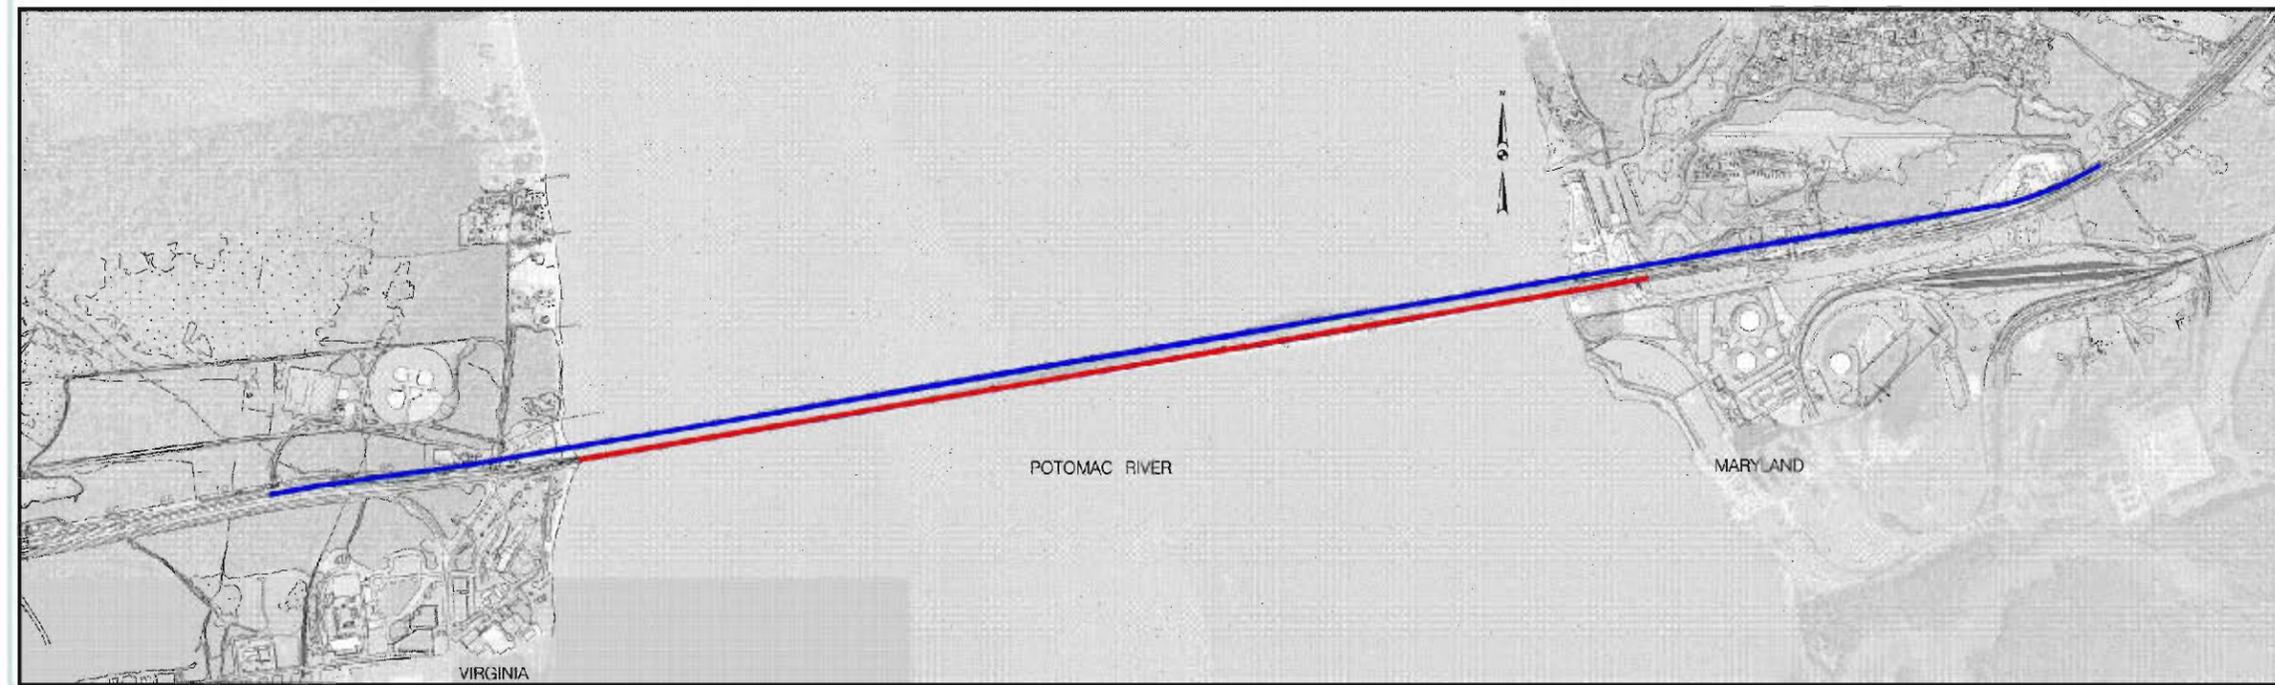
Alternate 5 - New Two-Lane Bridge to the North, Replace Existing Bridge.
